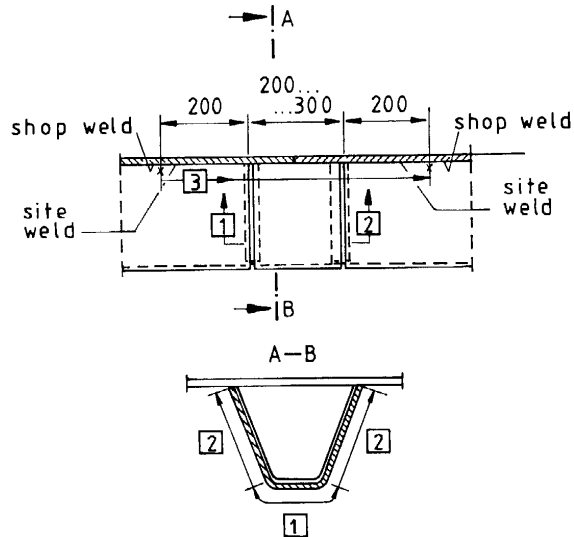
Welding sequence for the welded joint of the hollow section stringers with 'window-joint-technique', [Kahmann, 1973].
